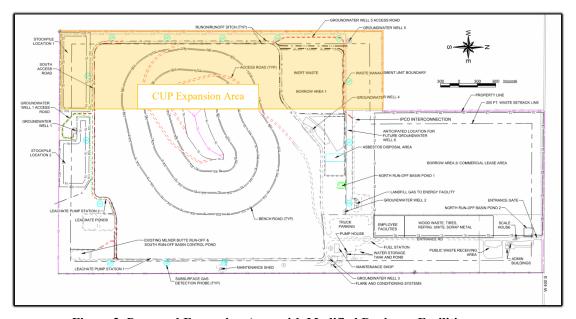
, Proposed Expansion Area with Modified Drainage Facilities
